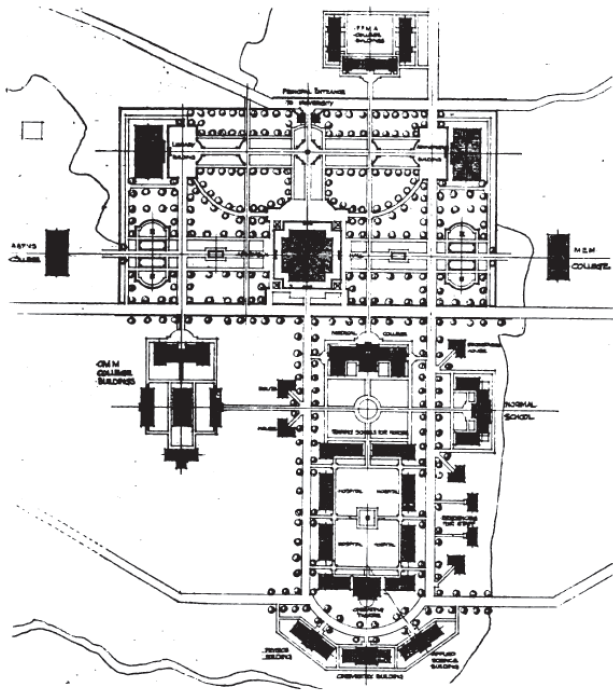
General Block Plan of West China Union University, Chengdu "Competitions," *The Building News* 104, no. 3027 (1913).
